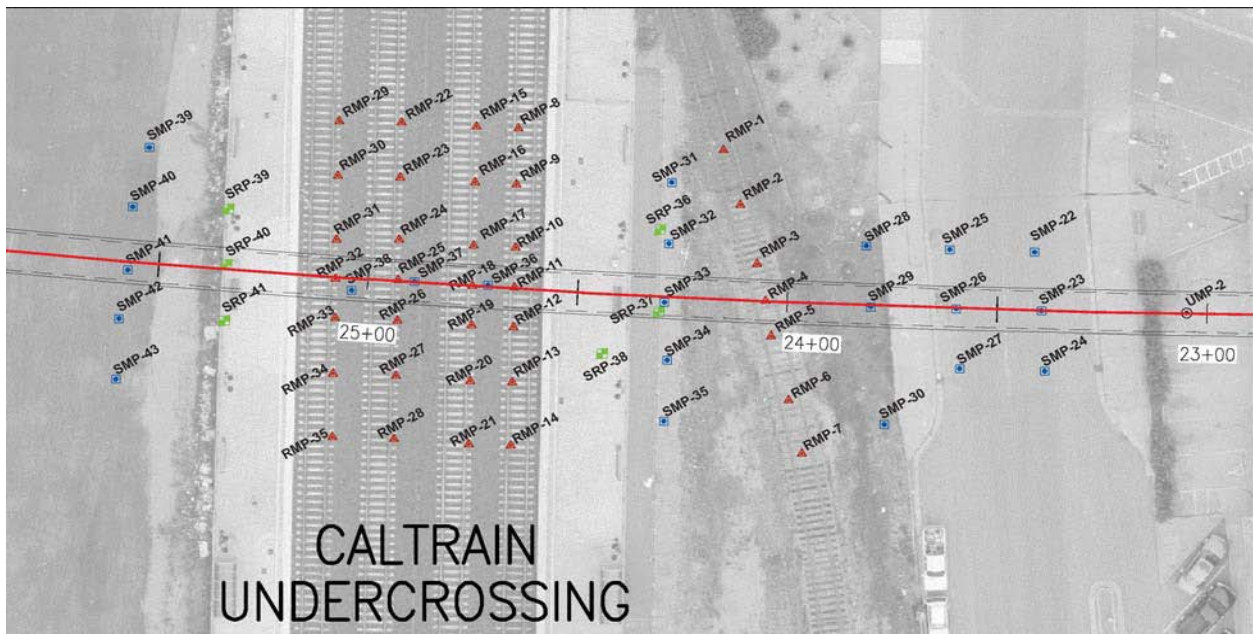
Geotechnical Instrumentation at UPRR and Caltrain Undercrossing.
